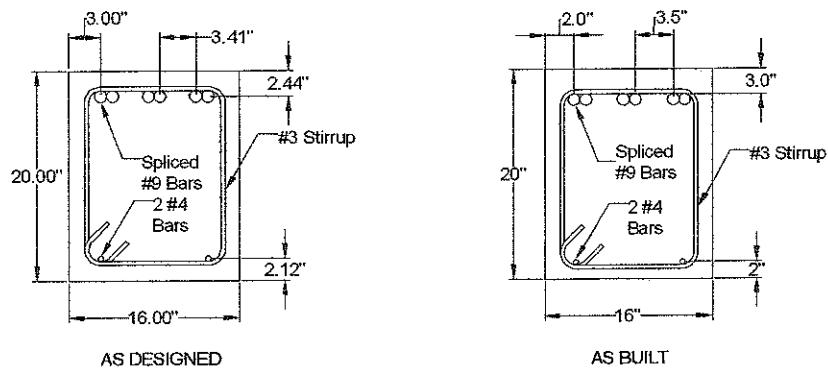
Cross Section of No. 9 Splice Beam Specimens
